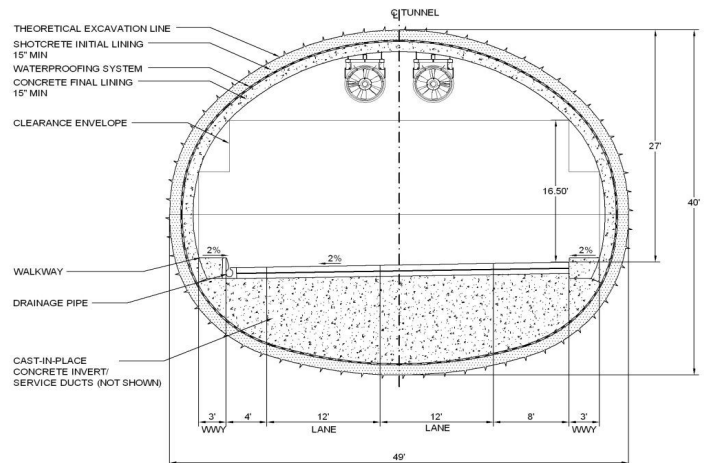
Typical cross-section of the two lane Montlake Cut tunnel.
